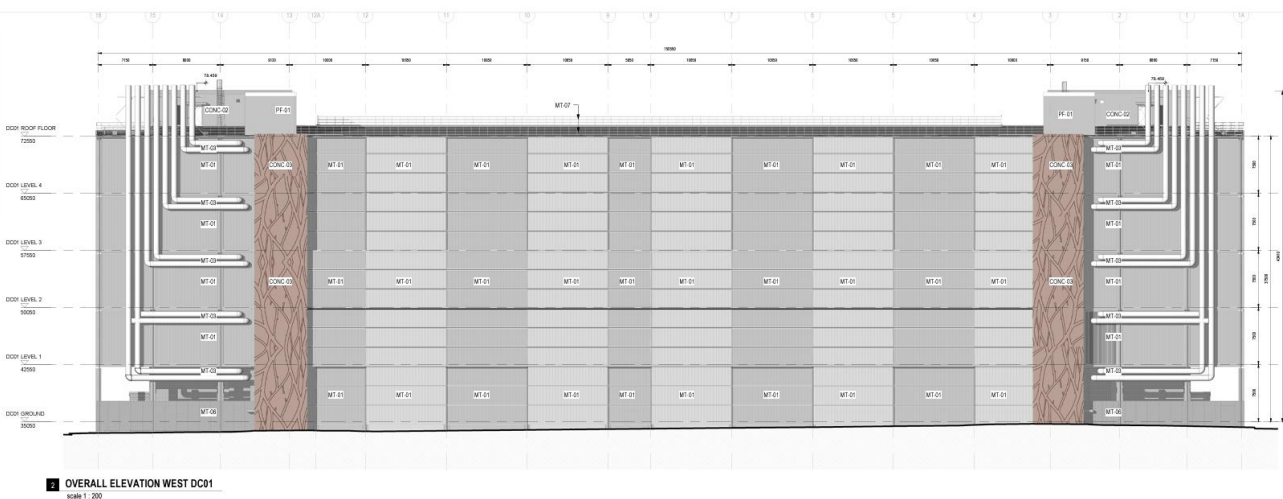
Overall Elevation - West DC01 of proposed development (Source: GREENBOX ARCHITECTURE)
